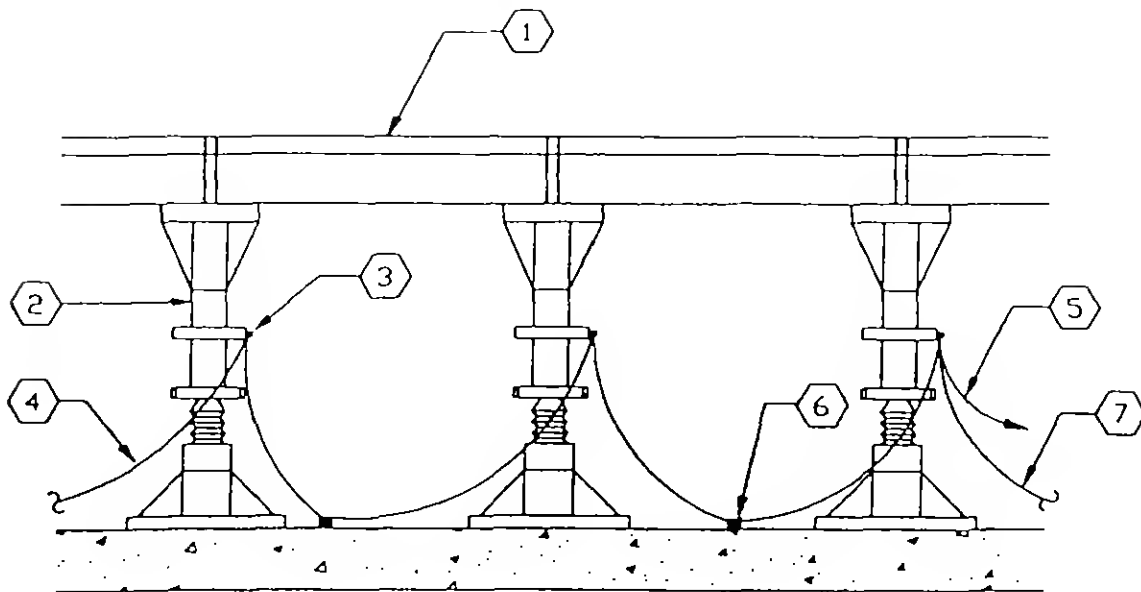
DETAIL "A" - TYPICAL SHIELD/DRAIN INSULATING METHOD
